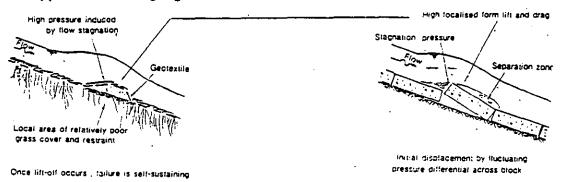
Failure scenario, geotextile Fig. 4: Failure scenario, concrete reinforced channels block model
